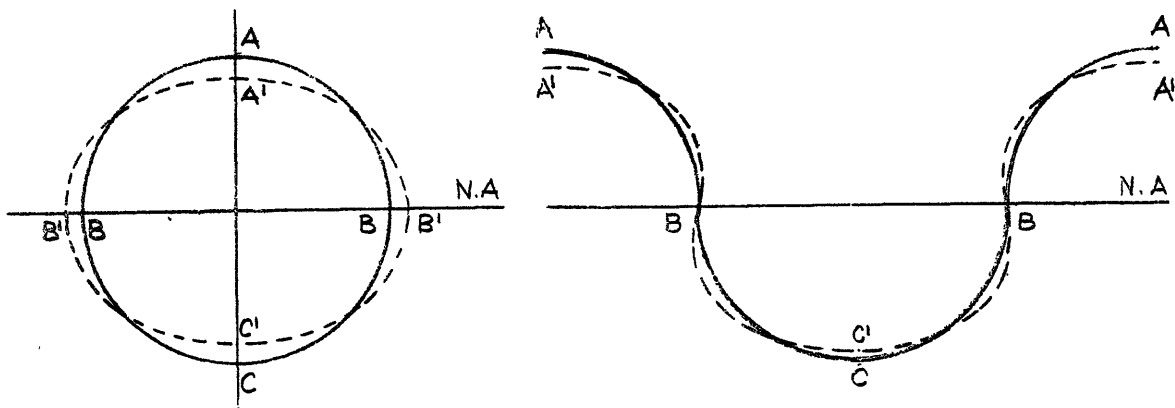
Distortions of the Cross Sections of a Pipe and a Shell
